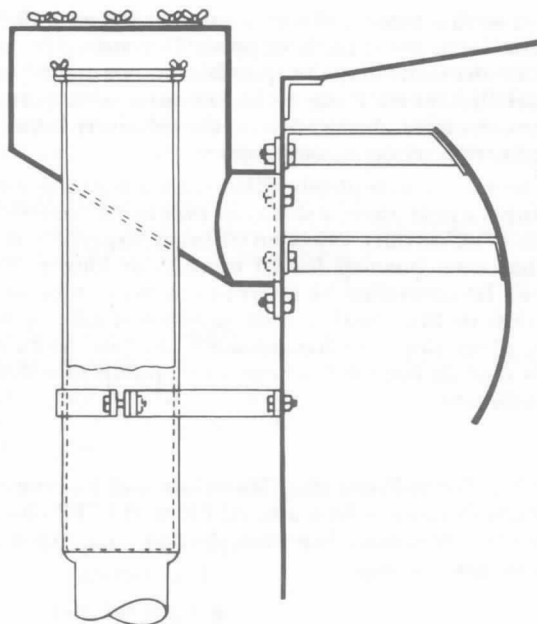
(c) Air Foam Chamber with Type II Outlet.
